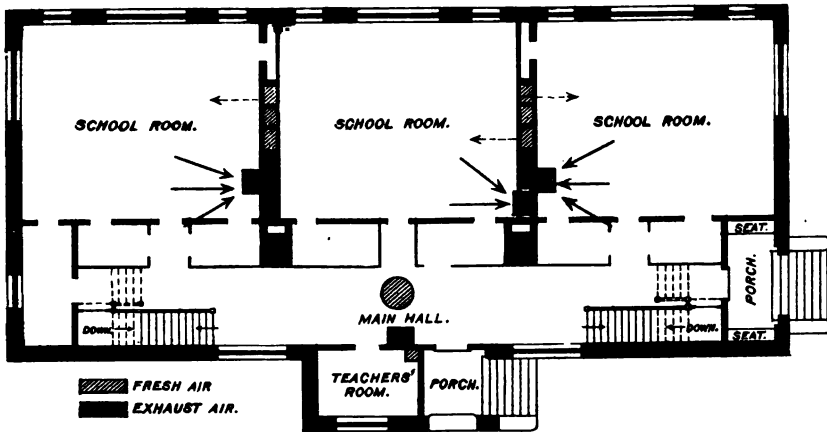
The Bryant school, Great Barrington, Mass. (First floor plan.)
